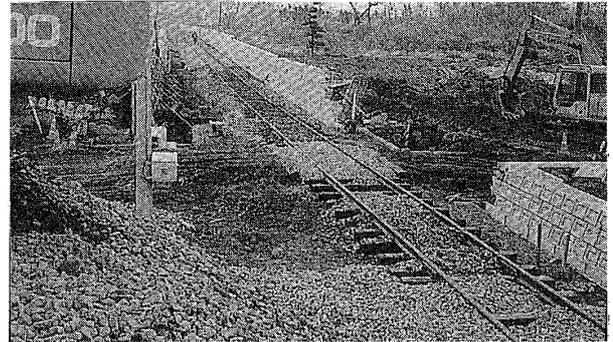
12/17/1991 (neighboring Kamata Town in 196)
